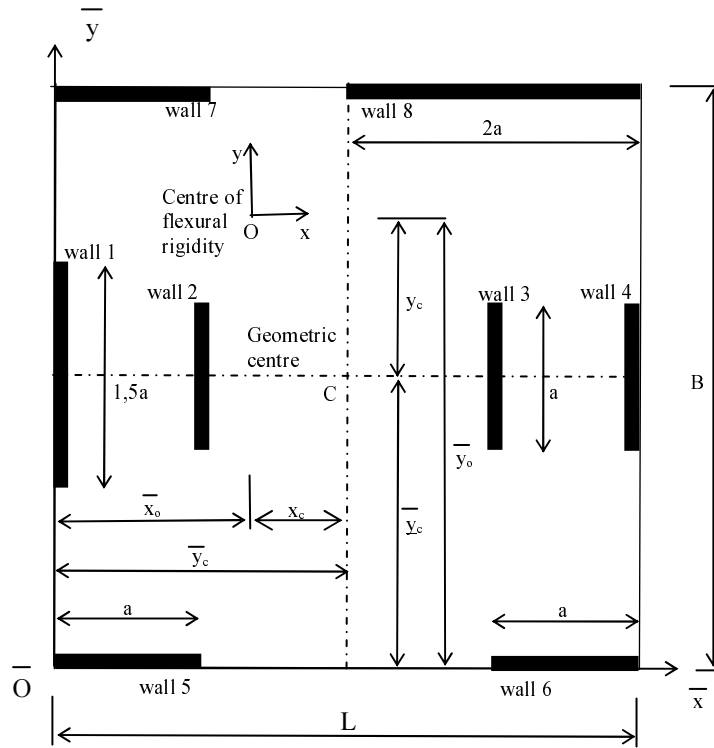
Typical floor plan of asymmetric frame structures [14]
